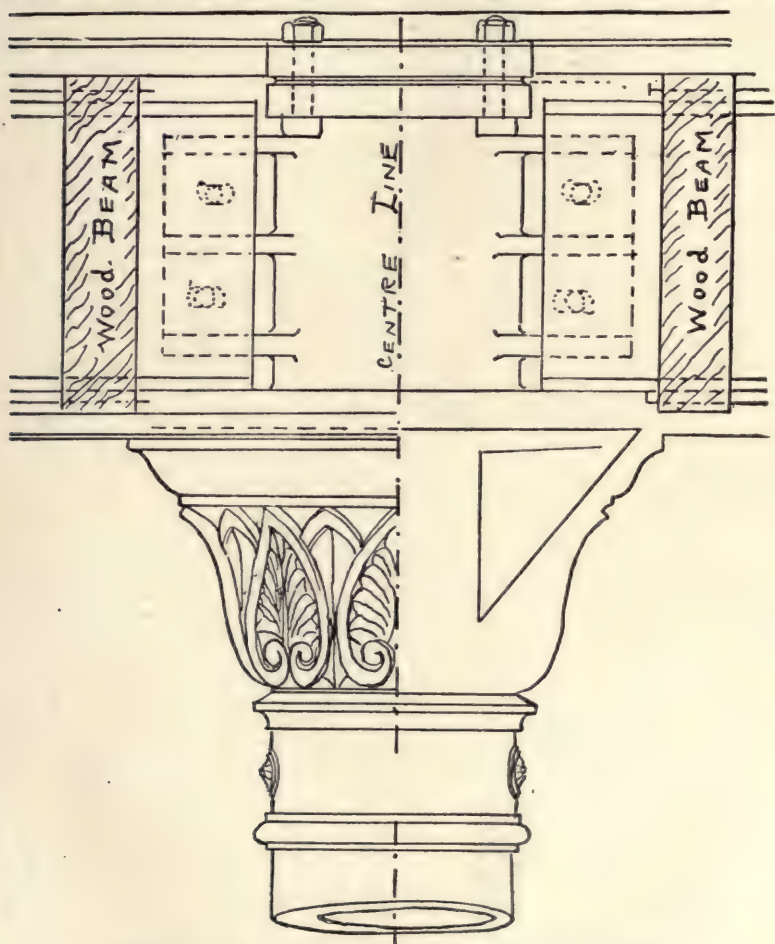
Longitudinal Section of Cast Iron Column Head.
